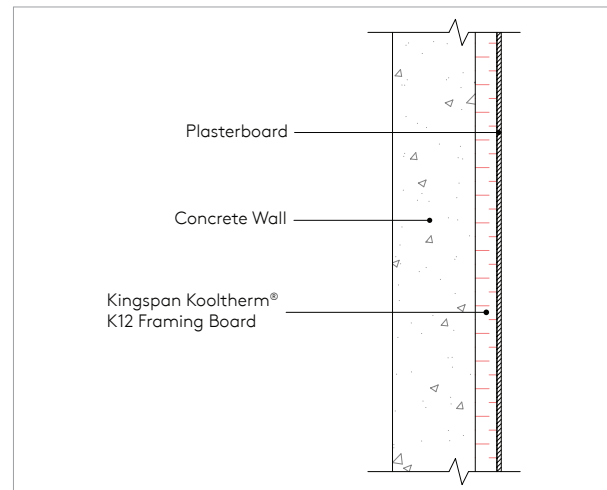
Side elevation of Kingspan Kooltherm® K12 Framing Board Mechanically Fixed to the Concrete Wall.
